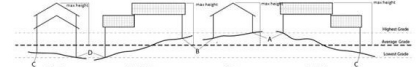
Sloped Lot Building Elevations Showing Existing Grade and Height (for a Gabled roof)
